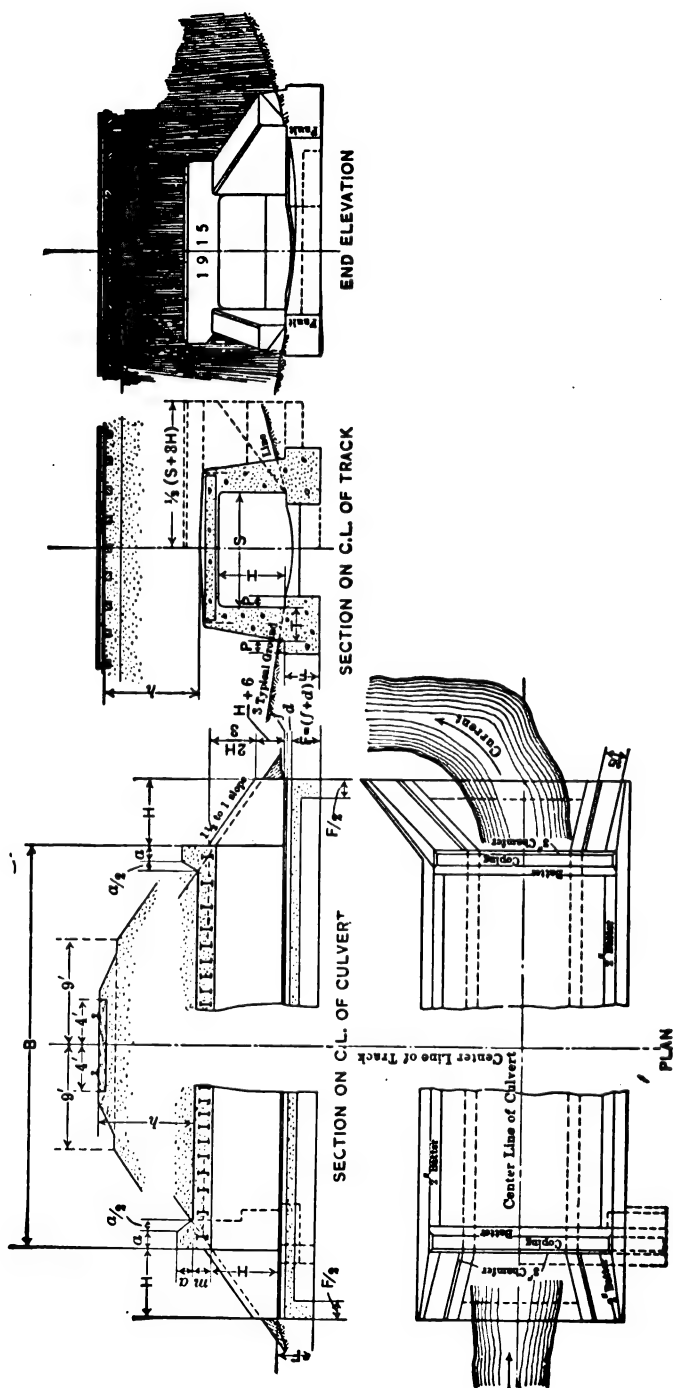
STANDARD BEAM TOP CULVERT, GRAND TRUNK RY.
